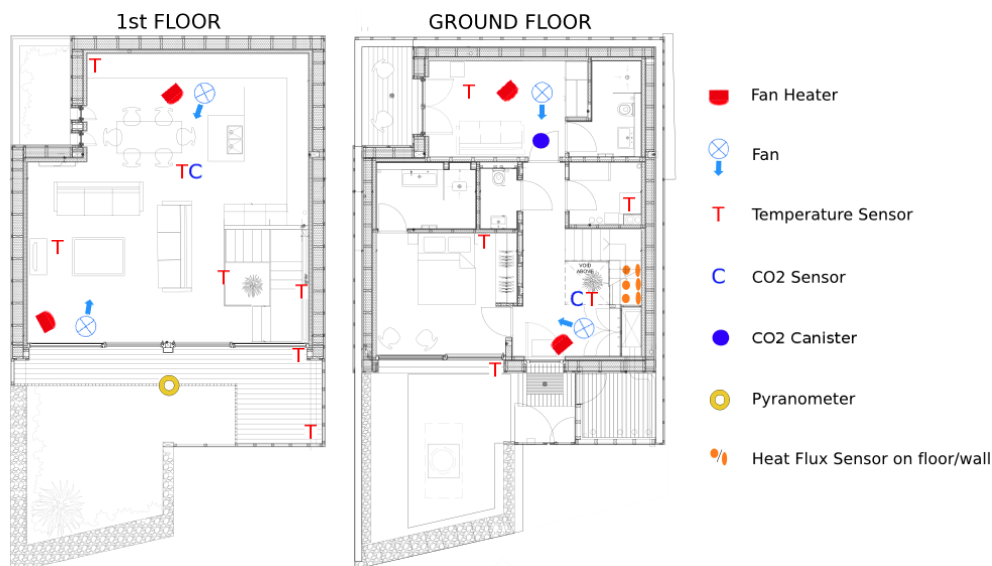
First Floor & Ground floor plans, with location of sensors and equipment for the first co-heating test.
